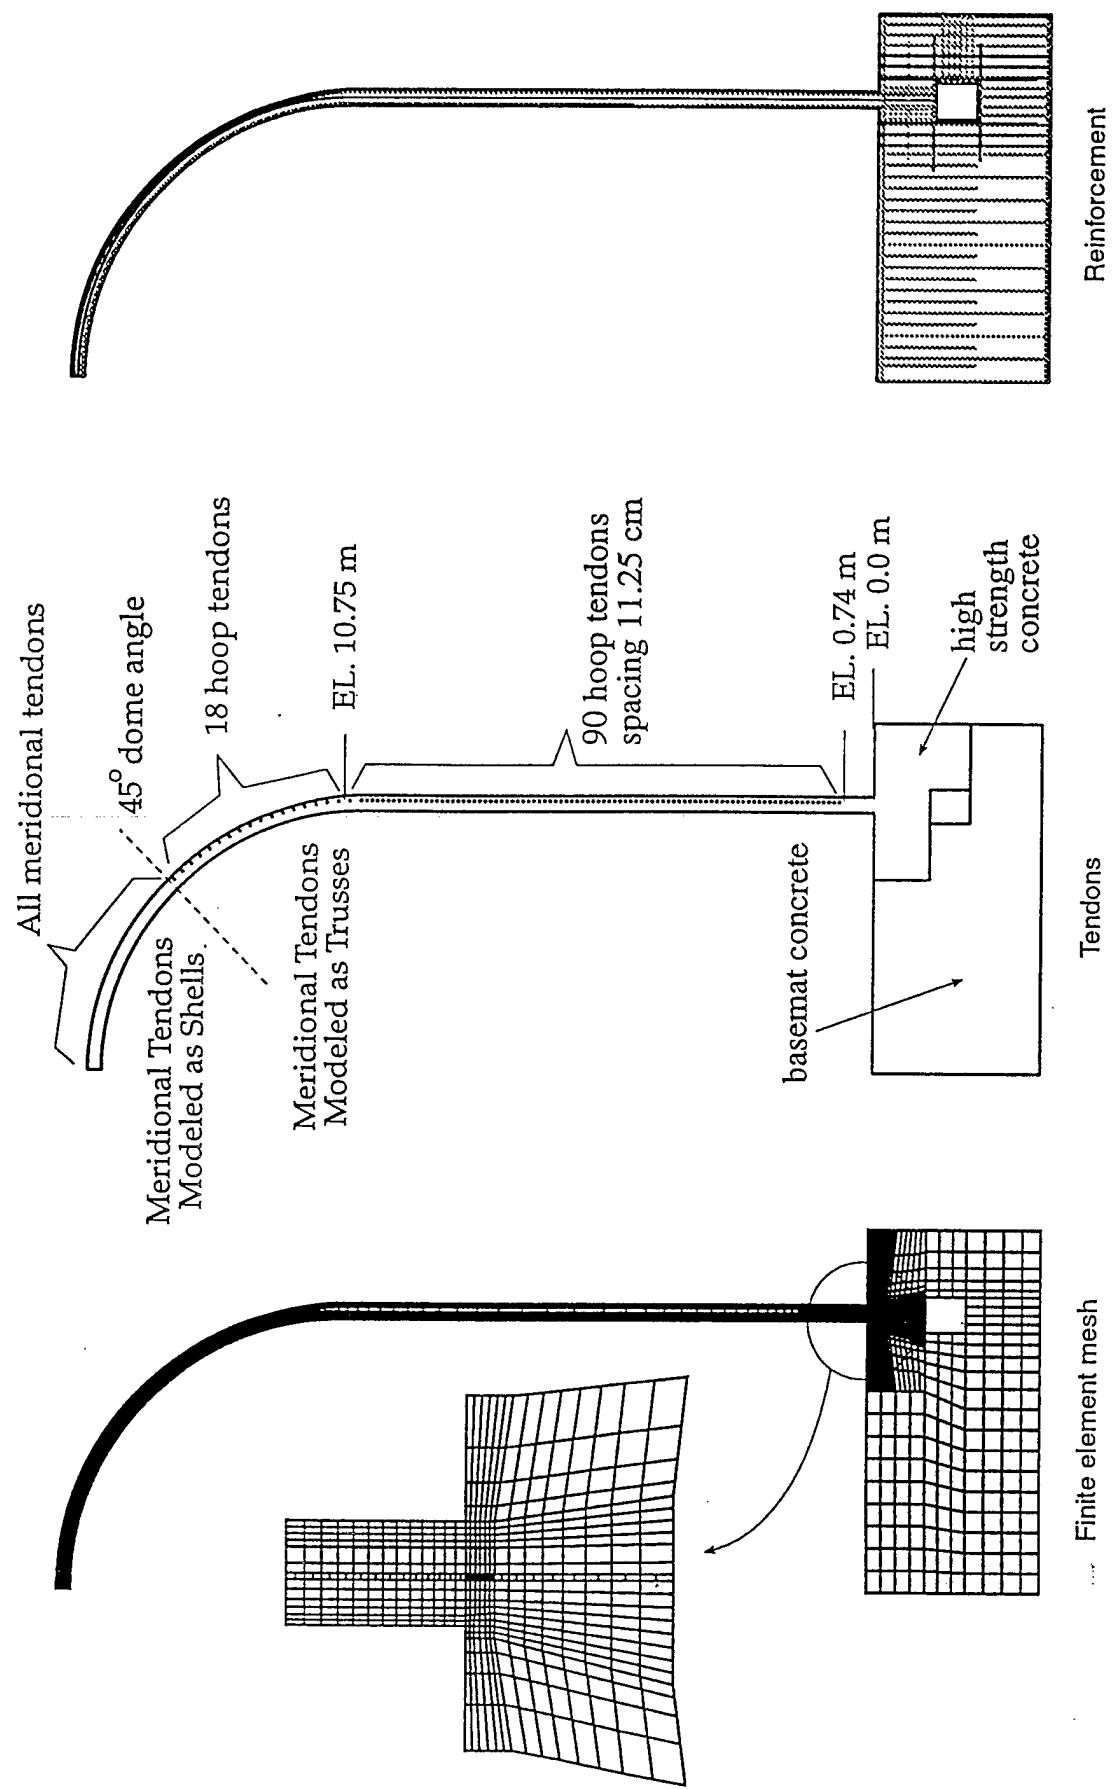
Axisymmetric Model, Tendons, and Reinforcement Used for Wall-Basemat Study
